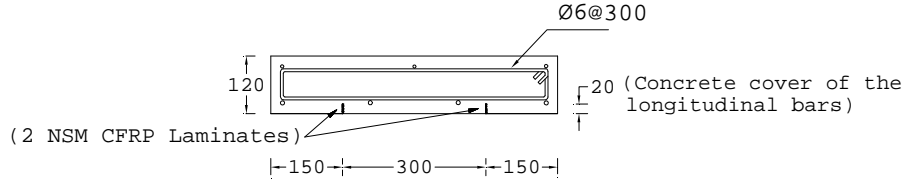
Cross-section of the RC slabs strengthened with NSM CFRP laminates with or without prestress (dimensions in mm).
